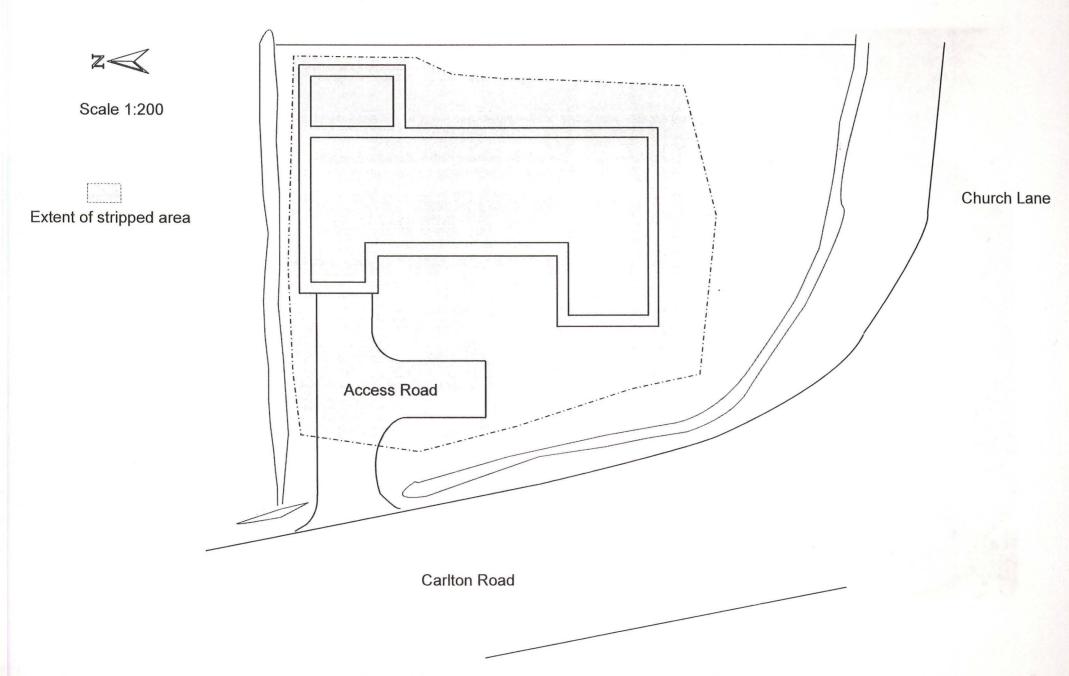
1:200 Plan of the development site showing the location of the foundation trenches
